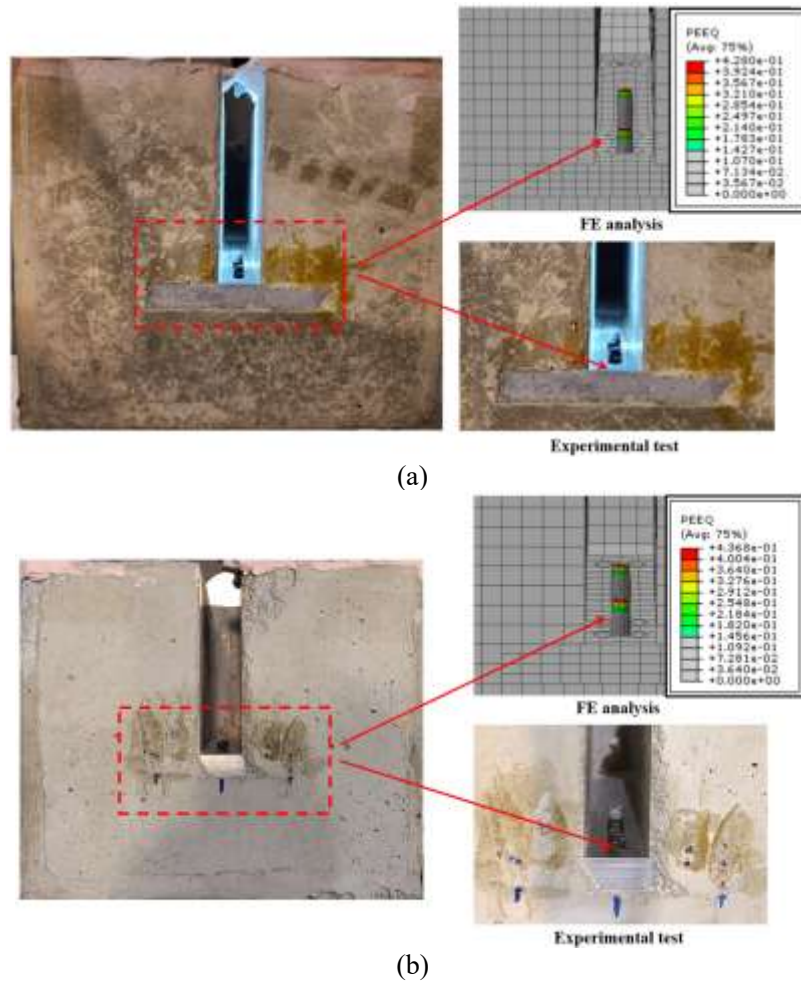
Bolt fracture failure in loaded block (a) N60E15, (b) N60E15-Update.
